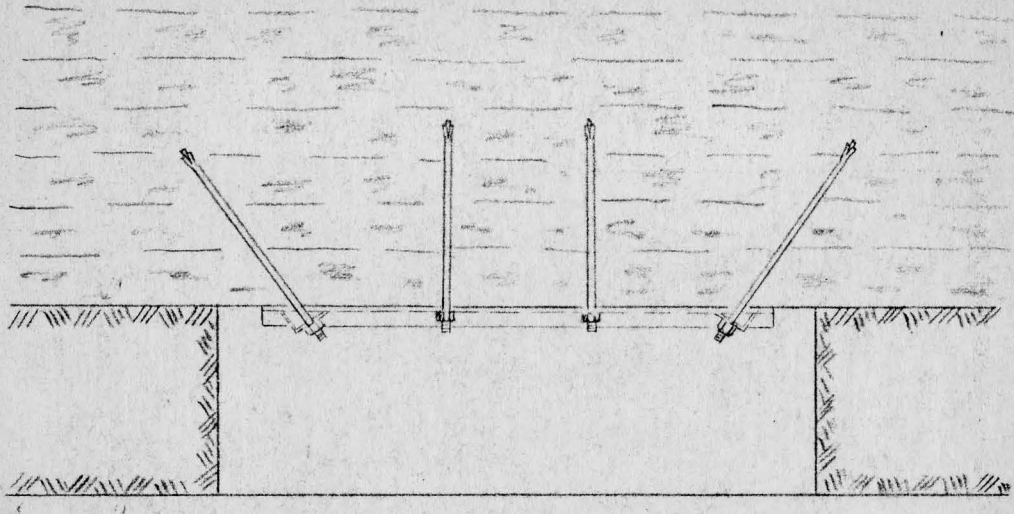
Installation of roof-bolts using a continuous channel iron instead of bearing plates.
